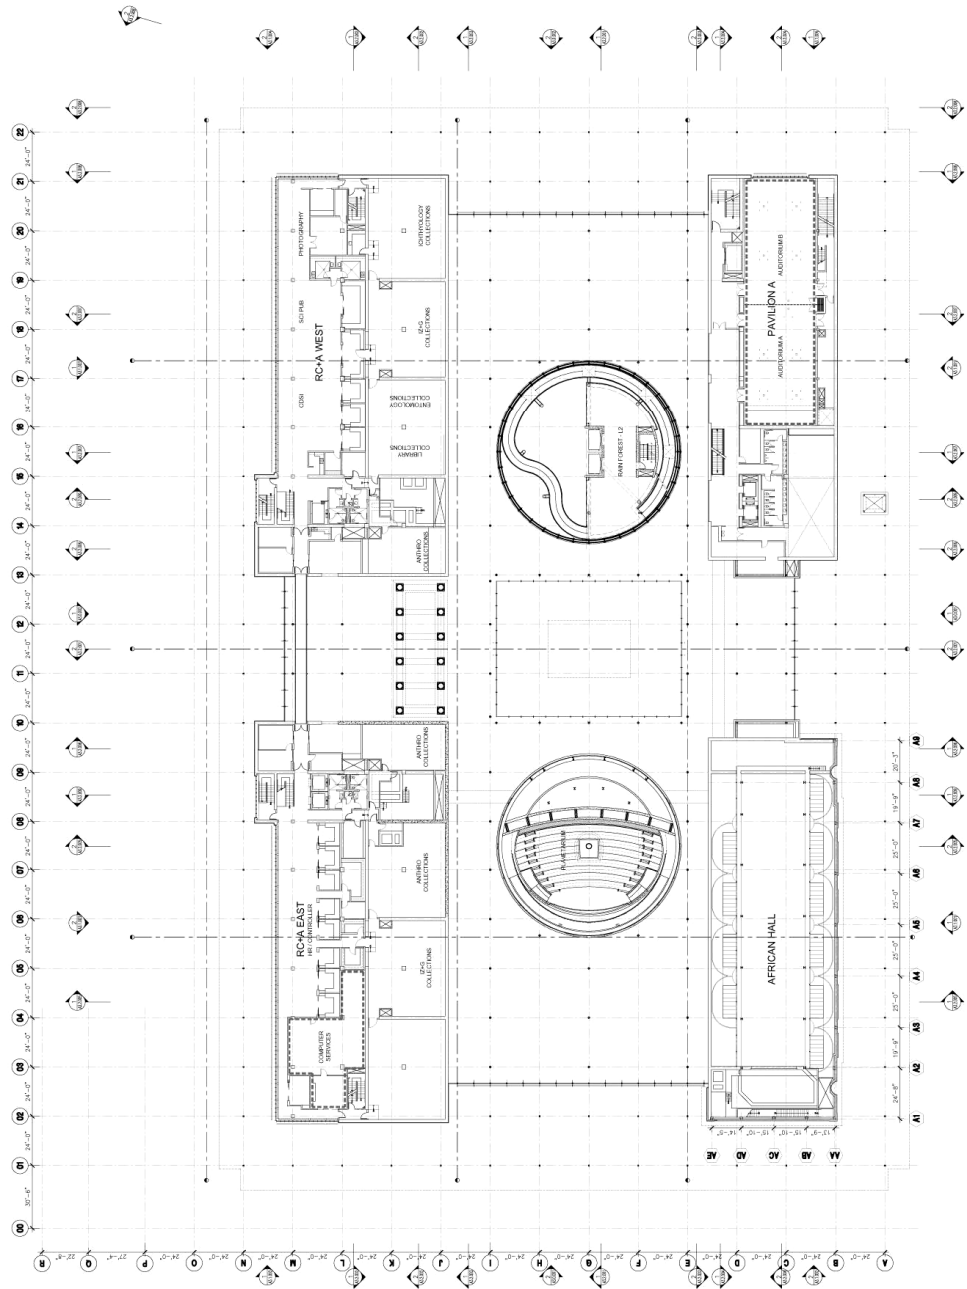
Upper Floor Plan, California Academy of Sciences
